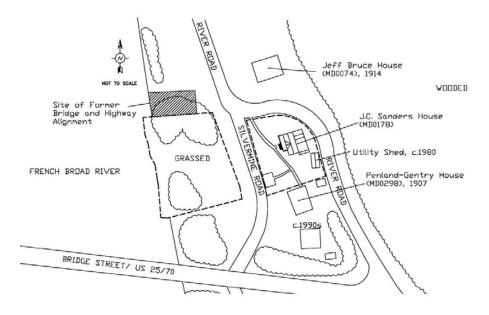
Site Plan and Surrounds of the J.C. Sanders House
